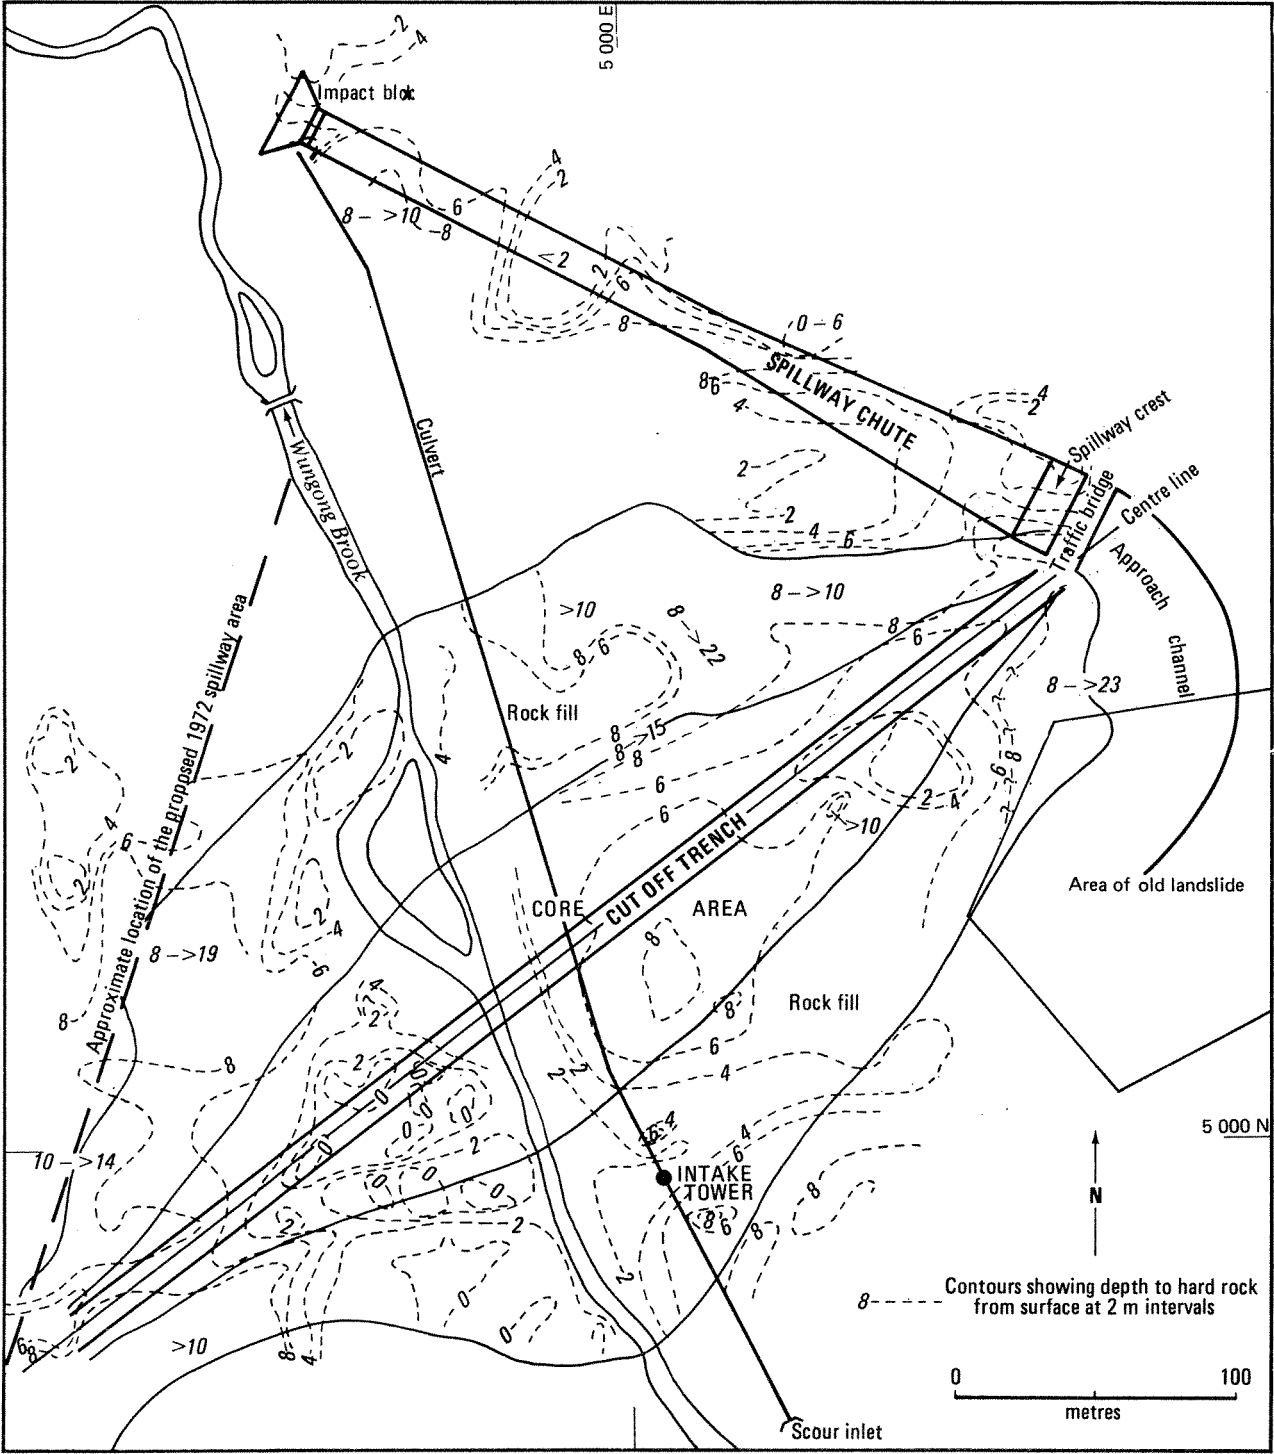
Site plan showing bed-rock depths, and final position of structure.
